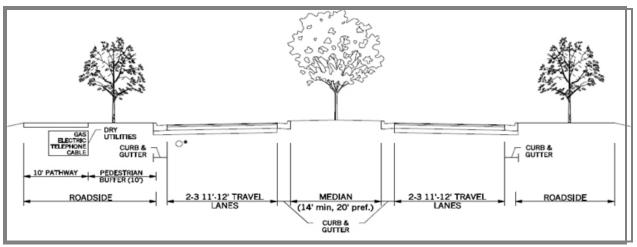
Thoroughfare Plan Cross Section: Major Arterial Suburban
